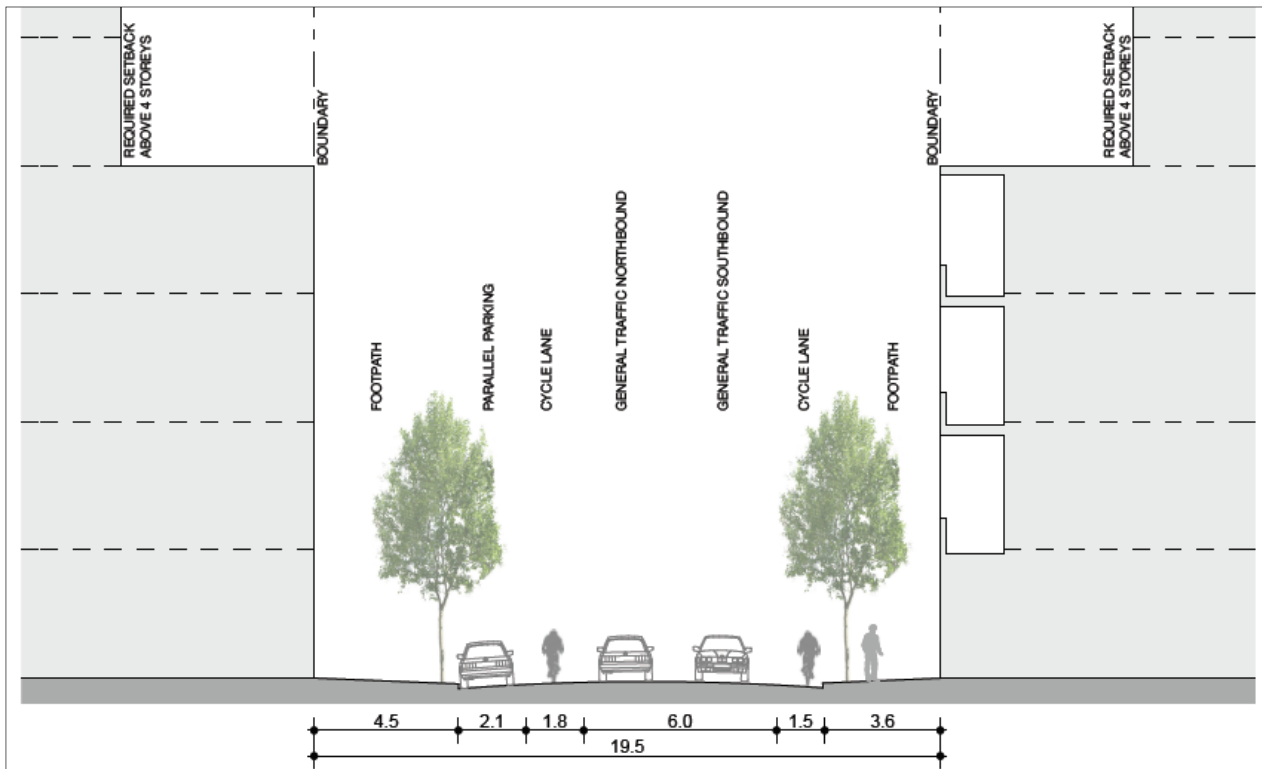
Proposed Lake Road Cross Section (Indicative) South of Bracken Avenue – Looking North⁵²
